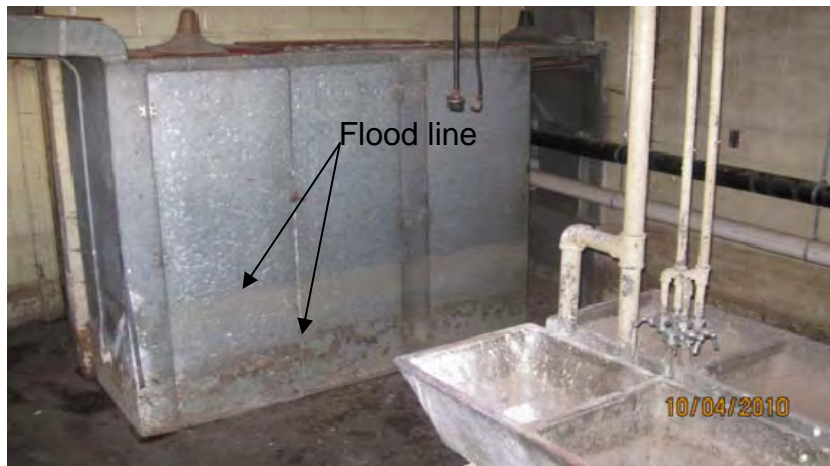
Basement Area with Abandoned Existing Laundry Facility
